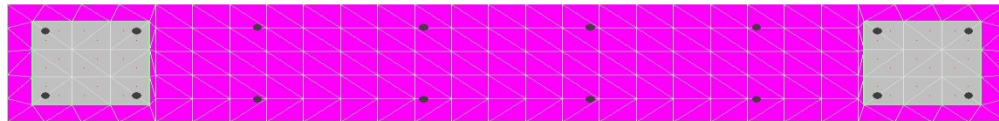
HSRC Additional Shear Wall SW200 Cross Sectional Detail
